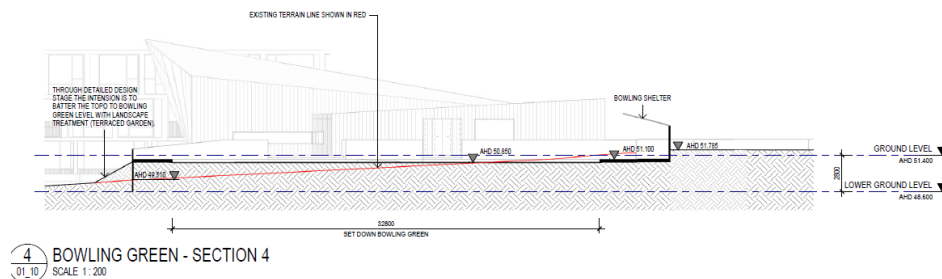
Bowling green, section 4, showing the existing ground level and extent of required excavation and fill. Outline of place of worship (located on north side of bowling green) is in the background.
